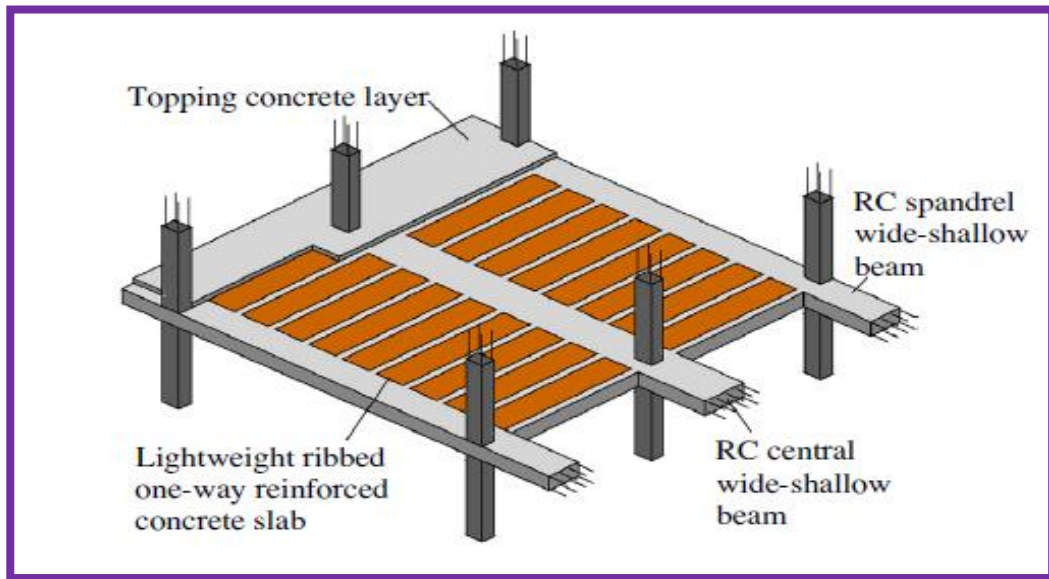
Typical floor made by WBS and light weight ribbed one-way RC slab [2]
